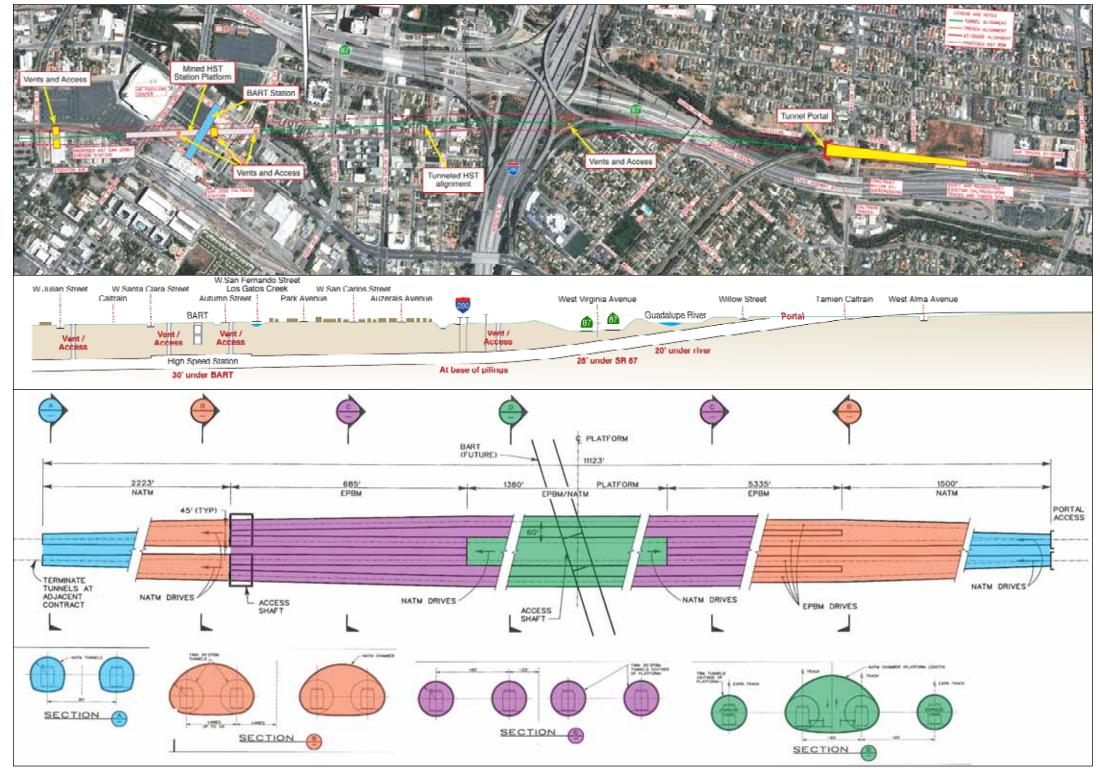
Plan & Profile and Track Configuration for "Deep Tunnel" Option
